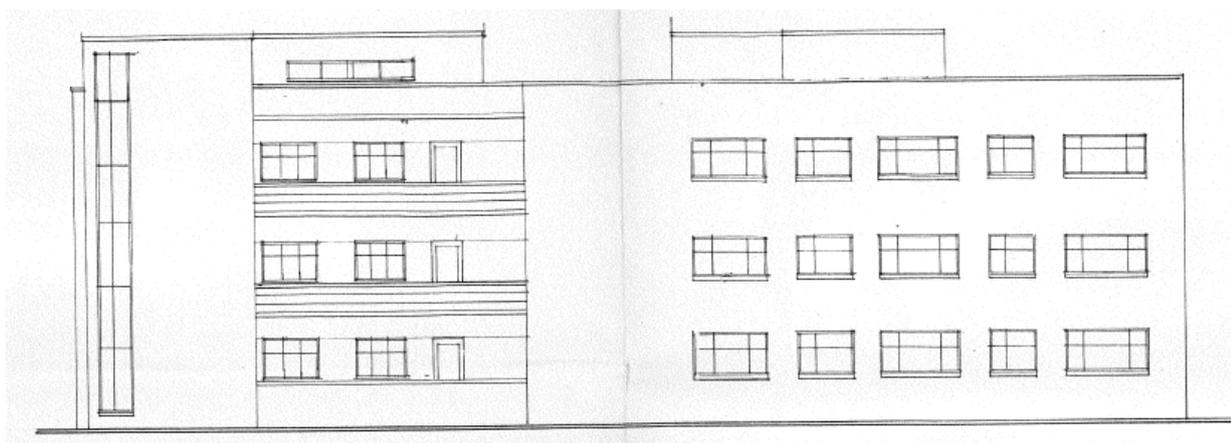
West elevation, from plans related to Building Permit U1174 (M Benshemesh, 1951) (Source: Council Building File)
